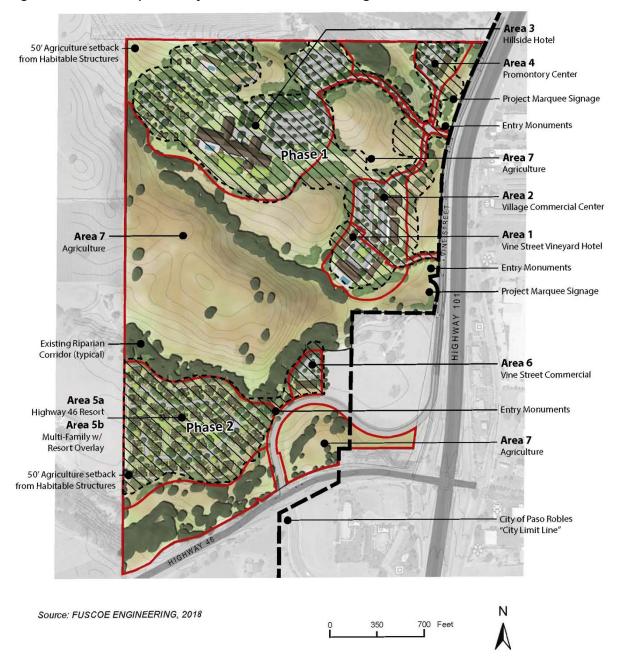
Conceptual Project Site Plan and Phasing Plan
